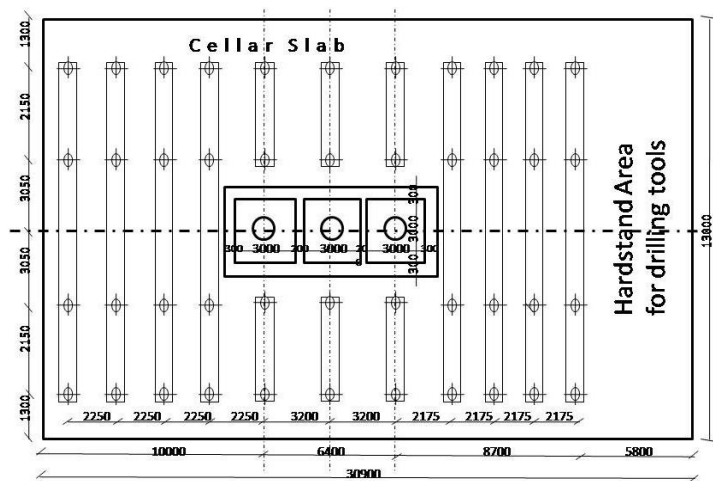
Drilling Platform showing the cellar slab, hardstand area and piling layout
